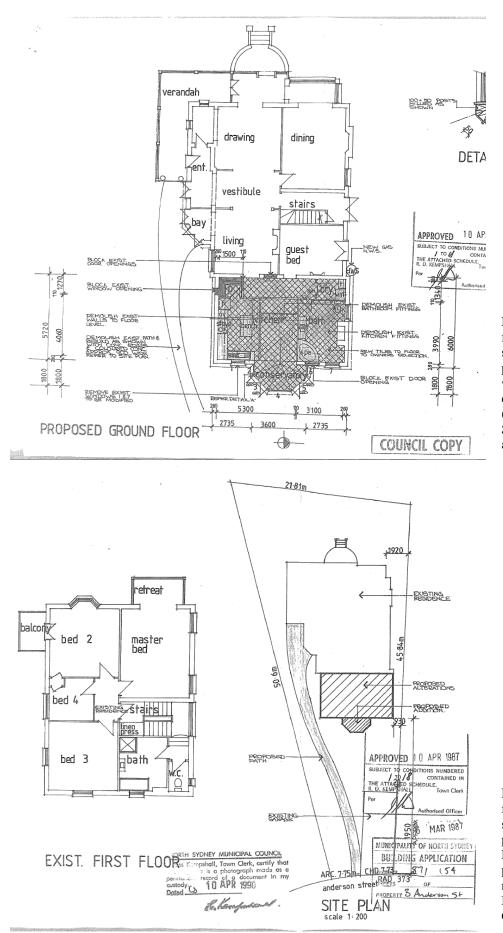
Extract from BA 87/154) showing ground floor plan of Lansdowne with proposed changes to rear wing (Source: North Sydney Council archives)
